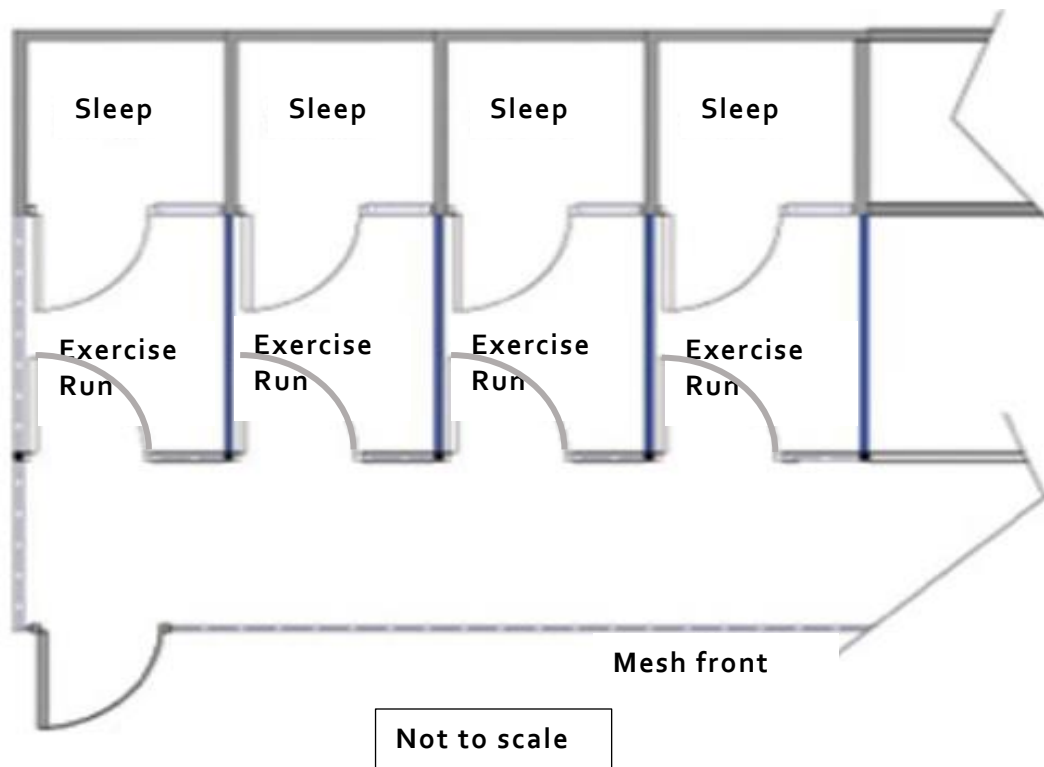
Example layout of outdoor cattery, with indoor sleeping area and individual covered outdoor run areas. These are accessed individually from a covered outdoor safety corridor. There are full height solid sneeze barriers (blue line) between cat units
